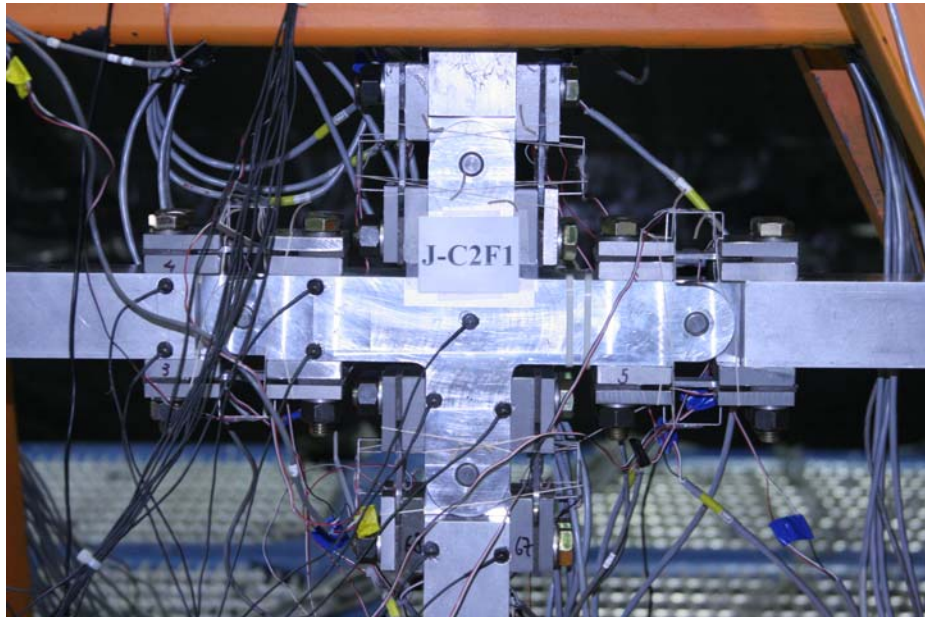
First floor interior joint after installation of all the local instruments (Frame #1)
